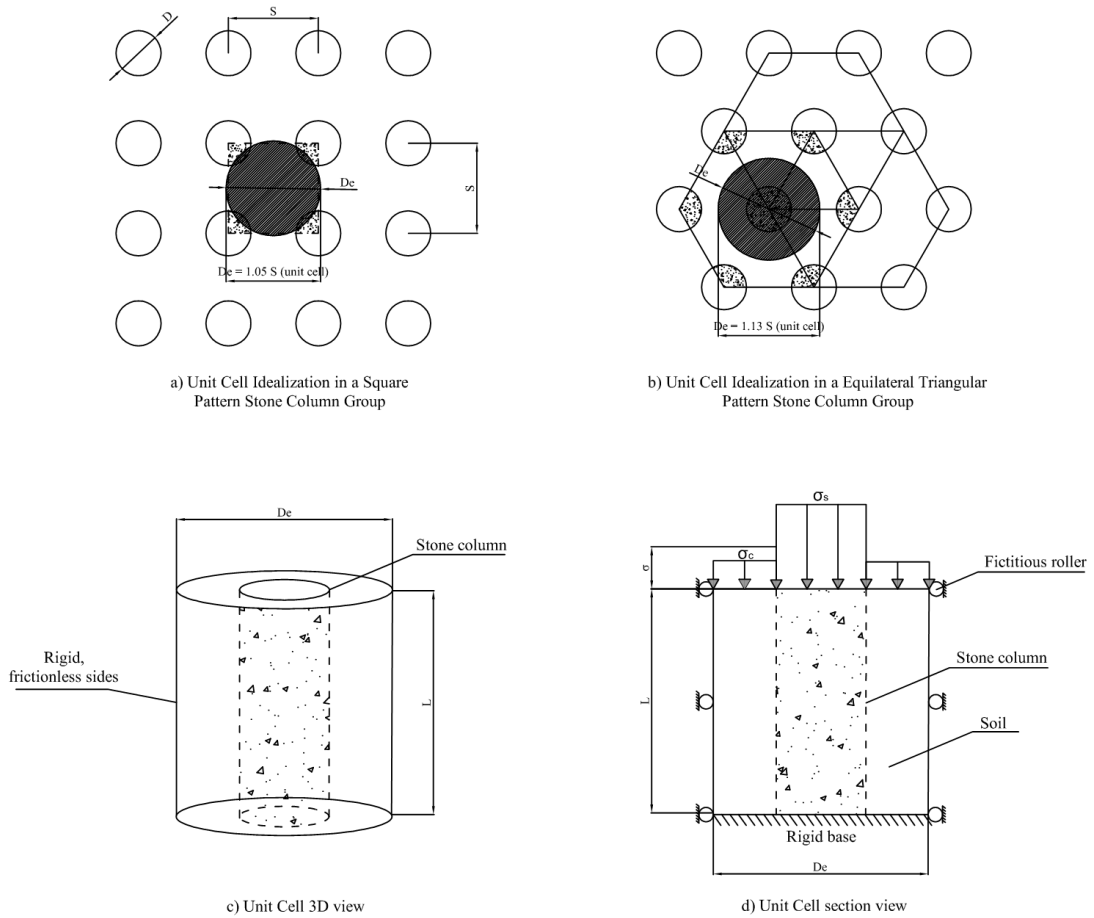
Unit Cell Idealization of Stone Columns (Barksdale and Bachus, 1983)
